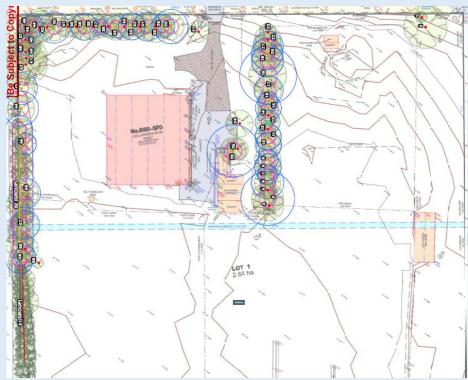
Tree Location Plan (Arbor Survey, Arborist Report).
